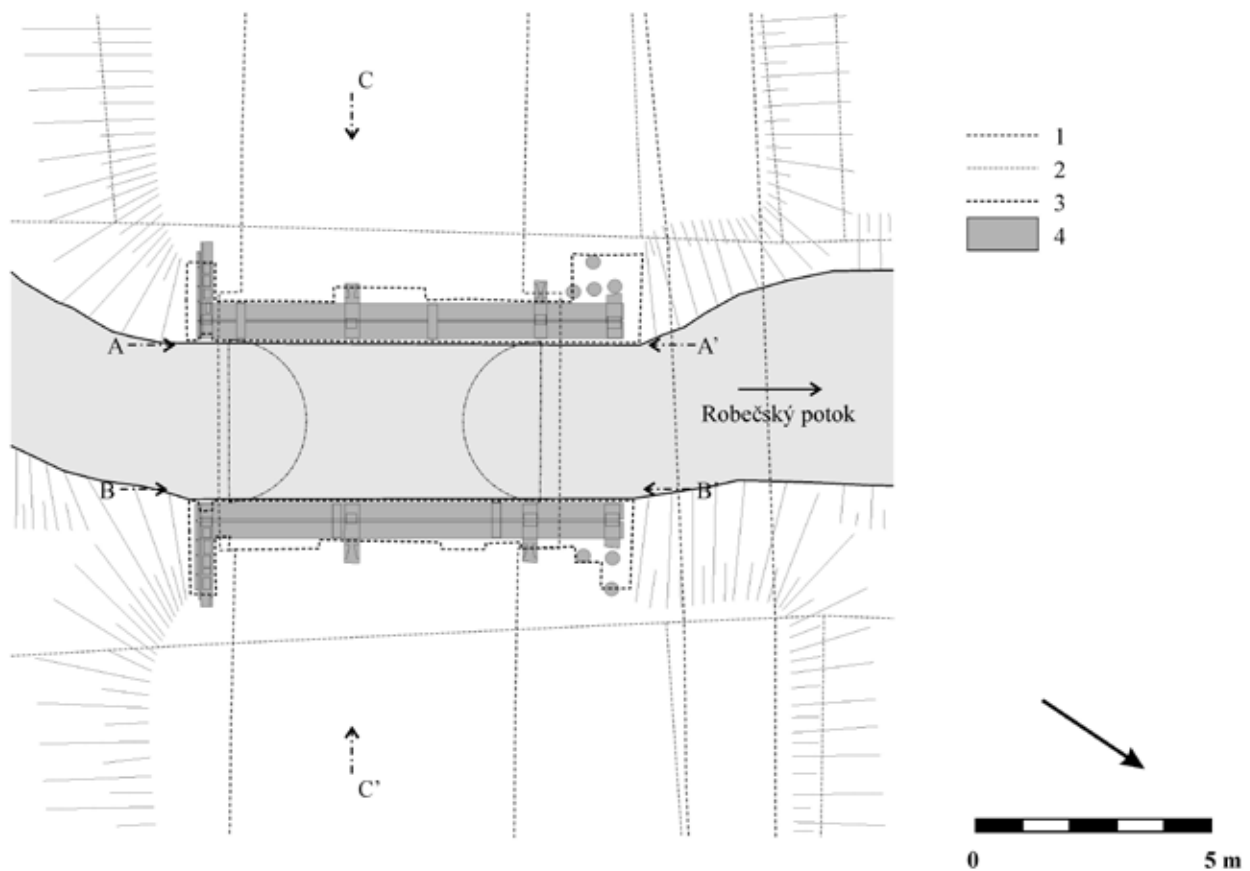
Floor plan of the wooden grid forming the foundations of the bridge.
